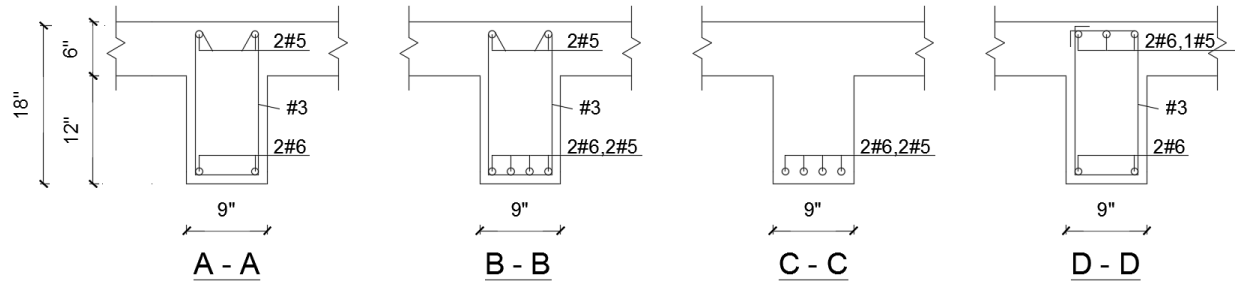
Beam typical sections (Bracci et al. 1992).
